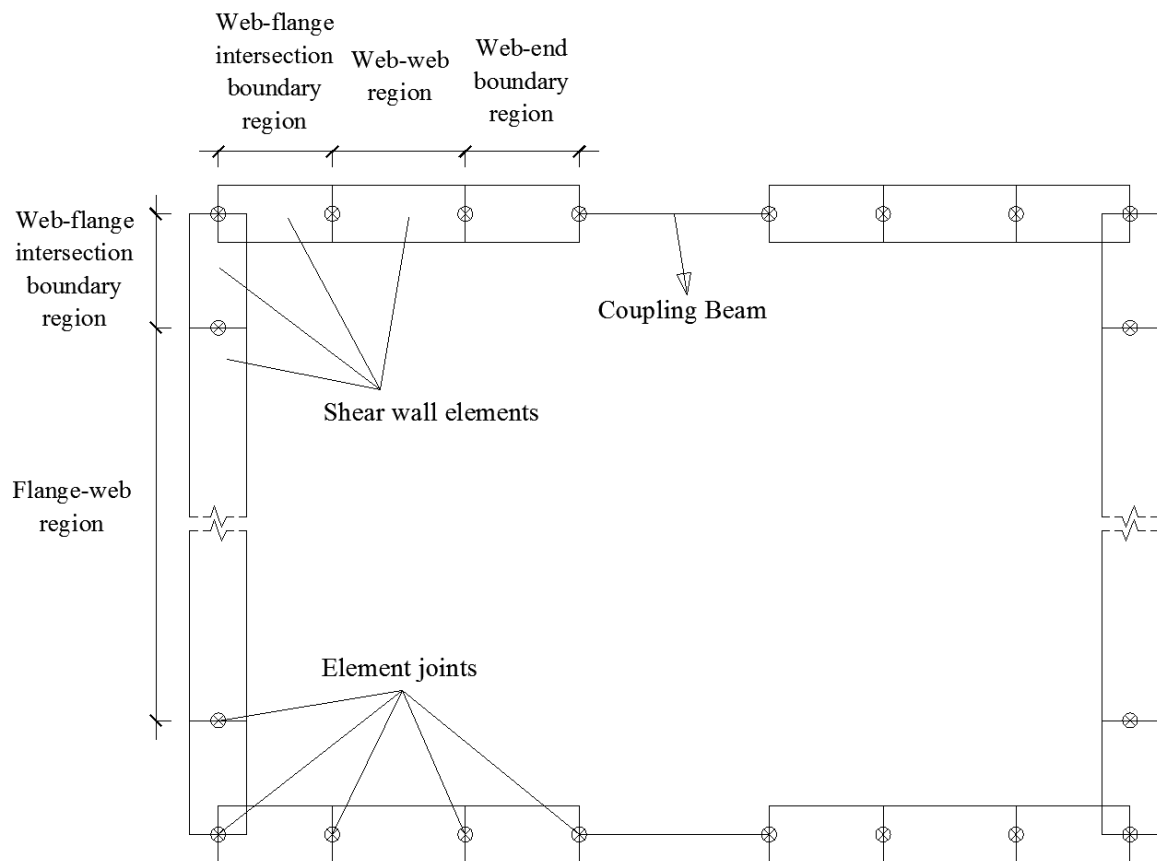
Typical coupled core wall system modeled in PERFORM-3D.
